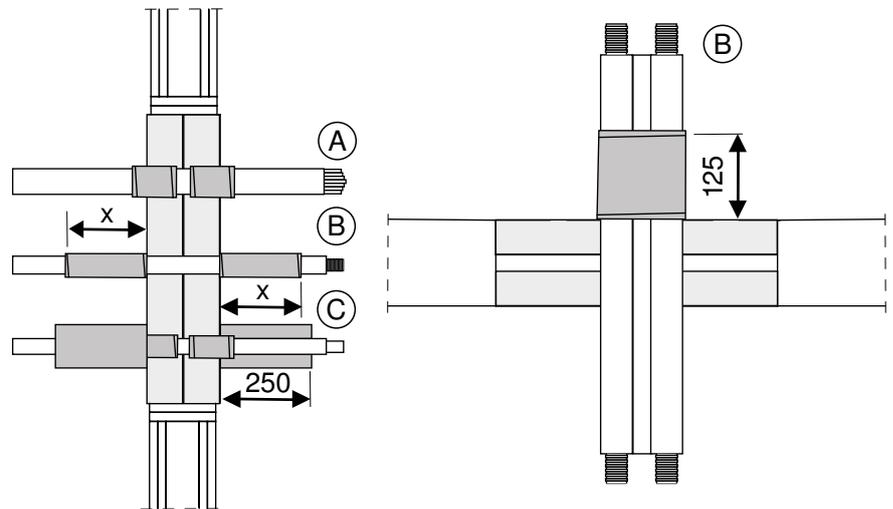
Fire protection bandage on other pipes in walls and ceilings
